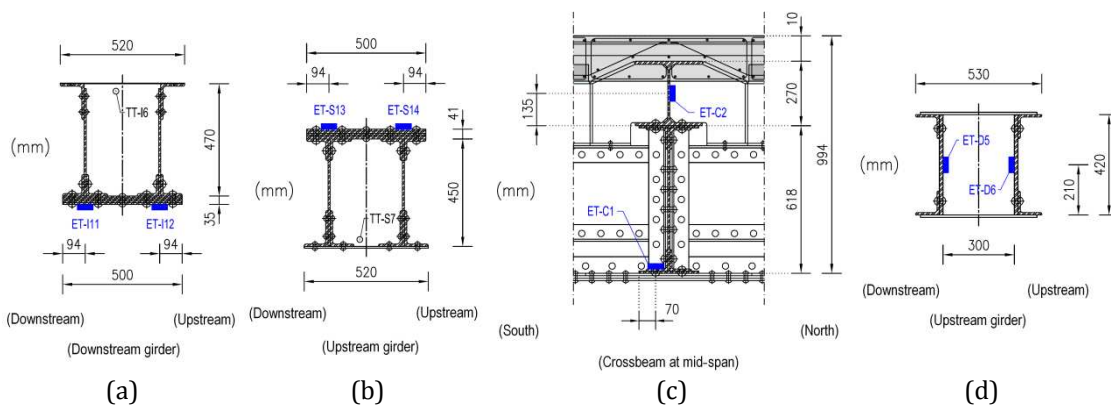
Examples of cross-sections instrumented in the north span: (a) lower chord; (b) upper chord; (c) crossbeam; (d) diagonal.
